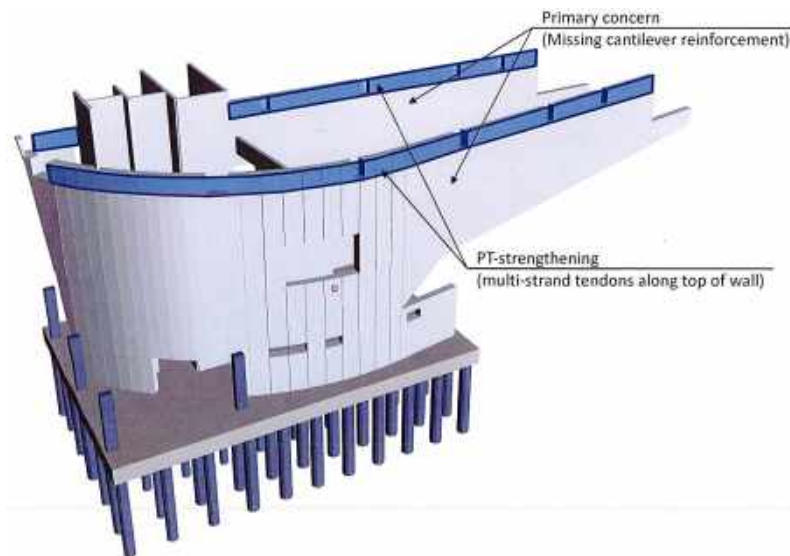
View of the Structure Illustrating the Installation of the Post-Tensioning Tendons along the top the Walls
